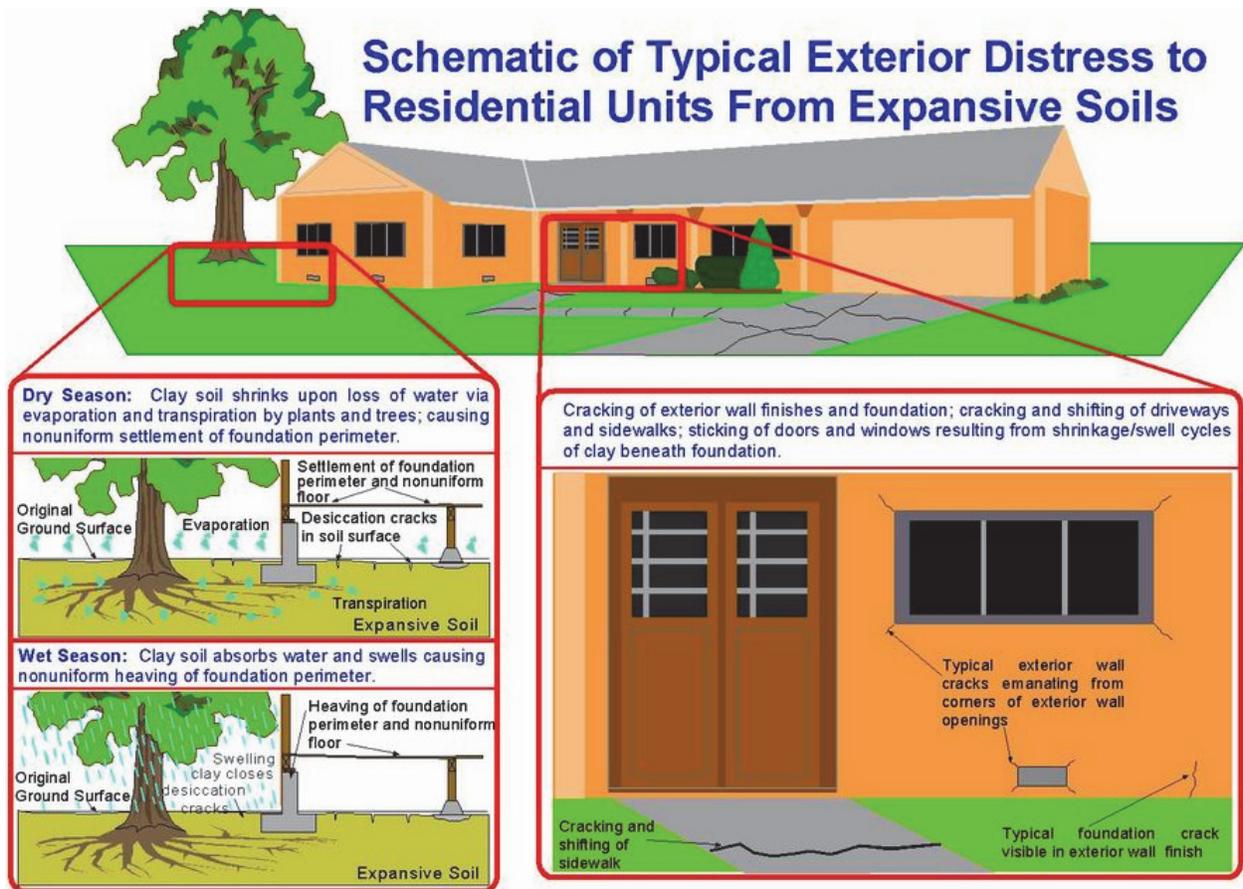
Schematic of typical long-term, non-earthquake distress caused by expansive soil to the exterior of a residential building with a perimeter concrete foundation (image credit: Exponent).
